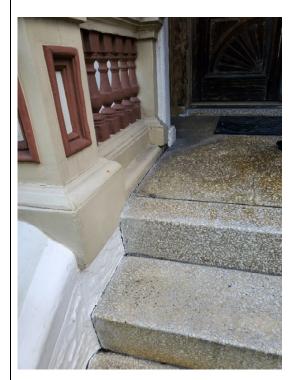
Cracking and gaps in concrete stairs allowing water to seep into enclosed crawlspace below stairs.
